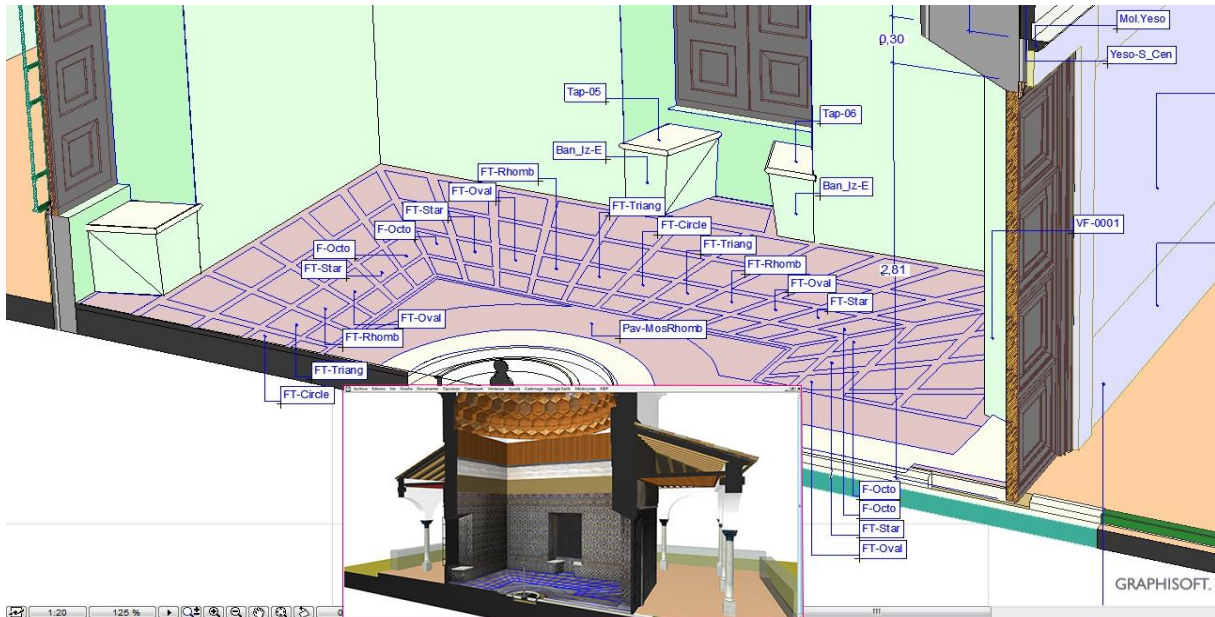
a. Session model with flooring once outlined. b. Floor sectorised by typologies: Shape, Floor Tiles layer, element's ID.
